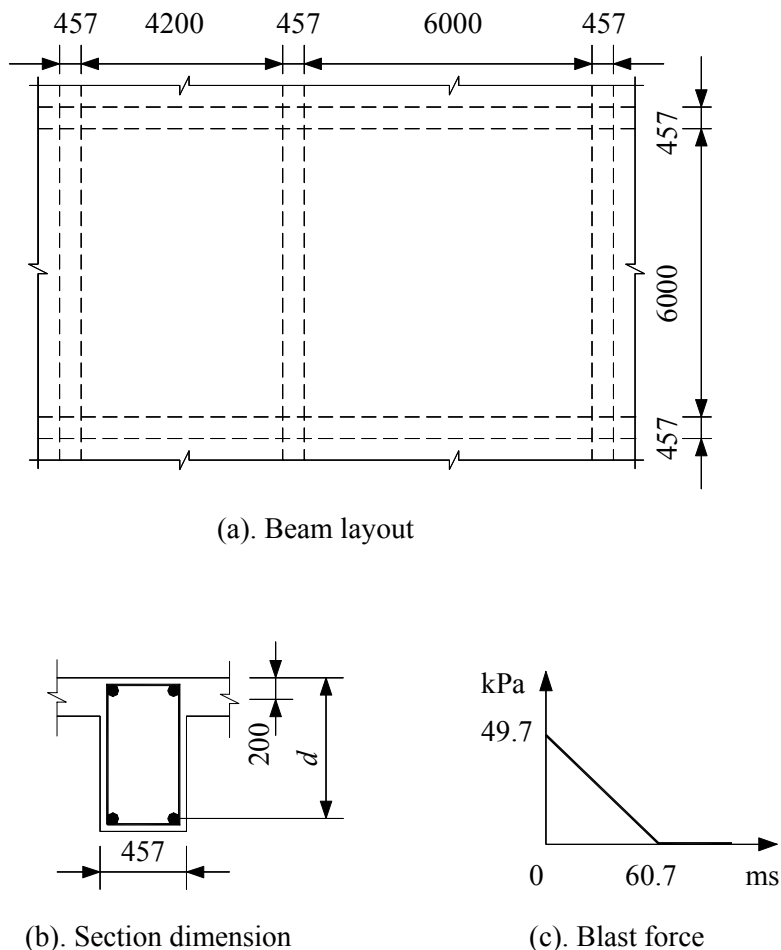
Layout of a fixed supported beam in design example II (unit: mm)
